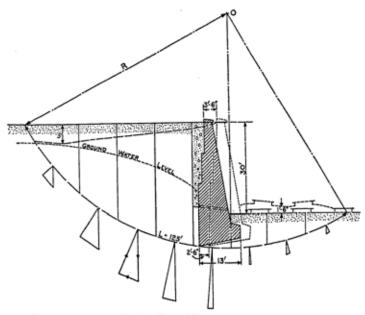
(b).—Overall Stability of Retaining Wall. (Problem 64.)
